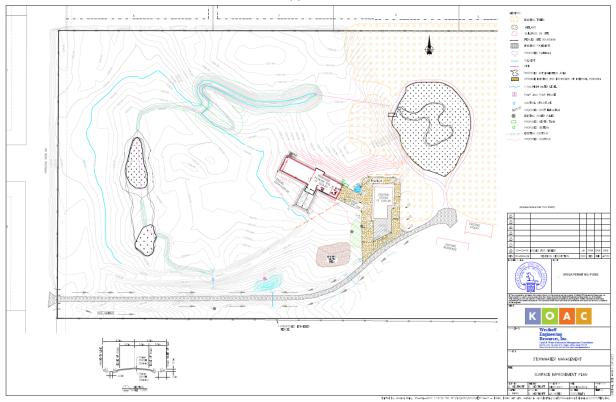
SURFACE IMPROVEMENT PLAN
